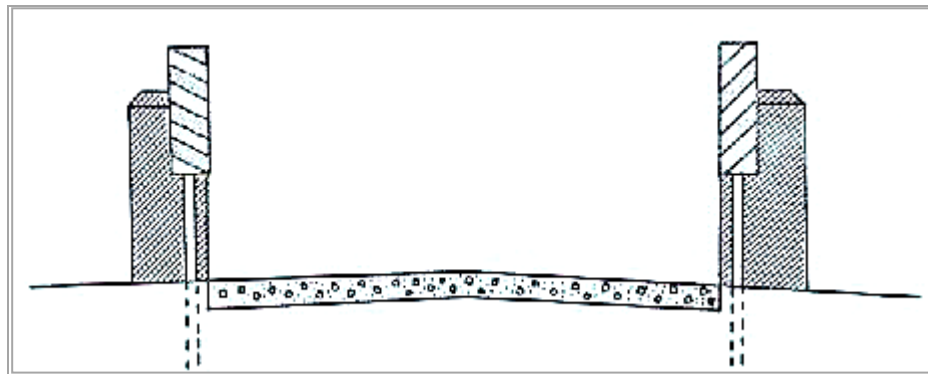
/23: Object Marker Location at Bridge End [4, p.V-32]
